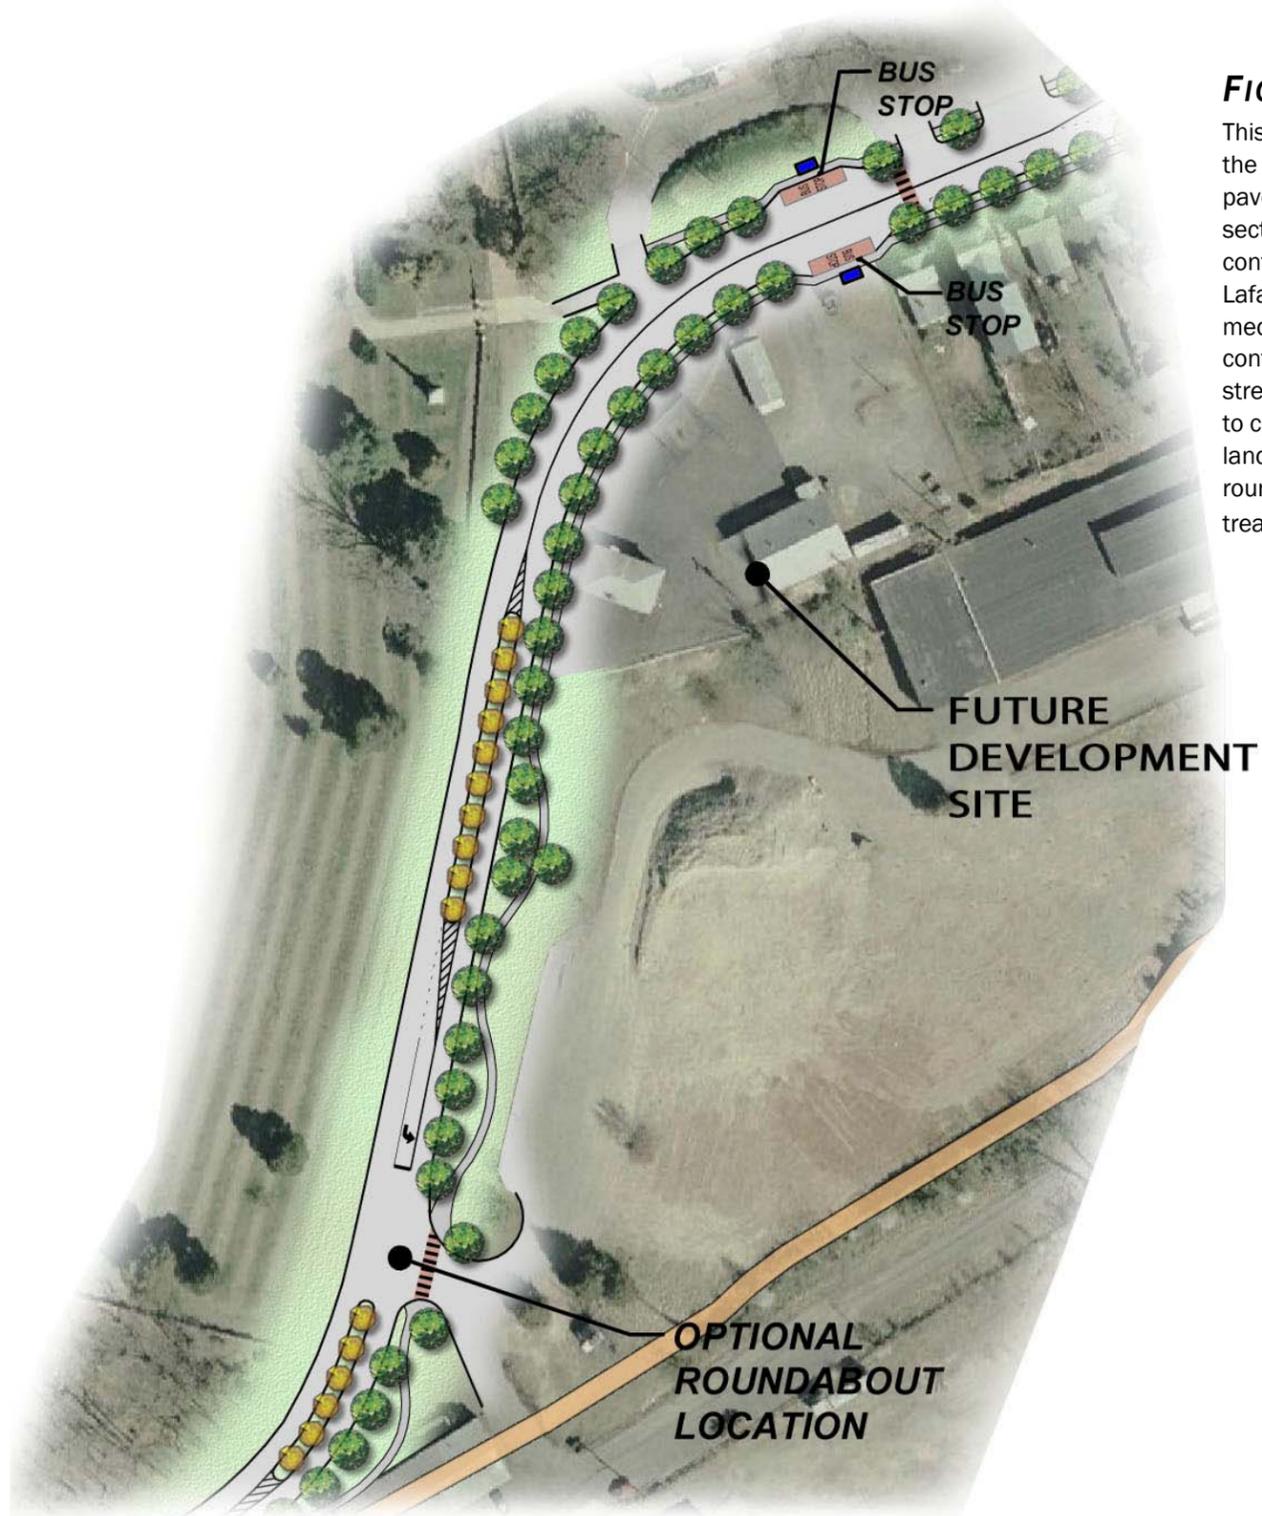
RECOMMENDED CONCEPT FOR LAFAYETTE BOULEVARD FROM SUNKEN ROAD TO ST. PAUL STREET
